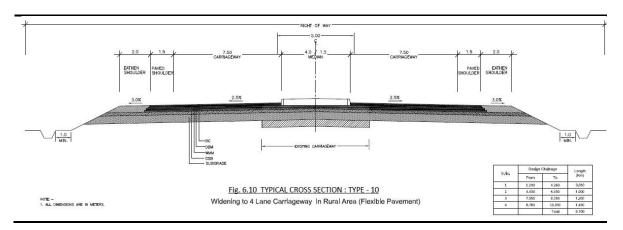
Typical Cross Section (Type-10) Widening to 4 Lane Carriageway in Rural Area
